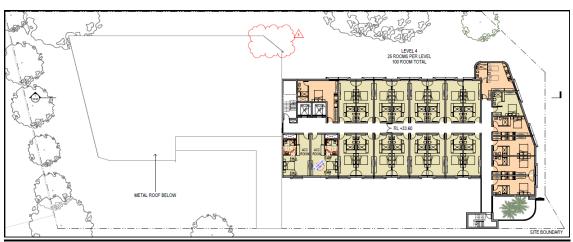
Previous hotel level 4 plan (indicative levels 2 & 3)
